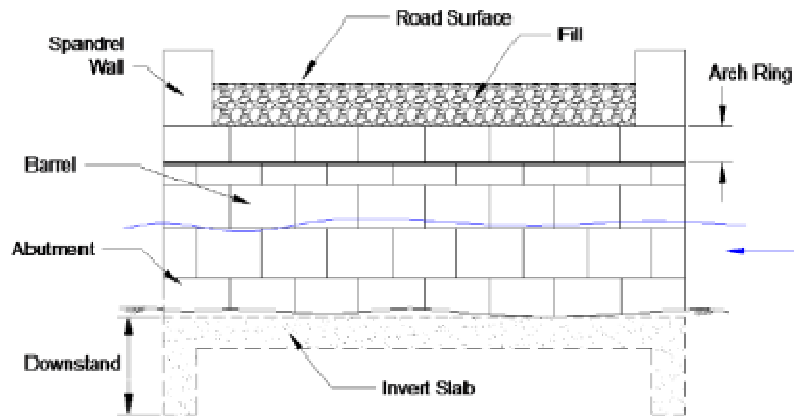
cross section typical of concrete slab for rehabilitating the foundation with permeable walls upstream and downstream the bridge (source Dezab 2011)
